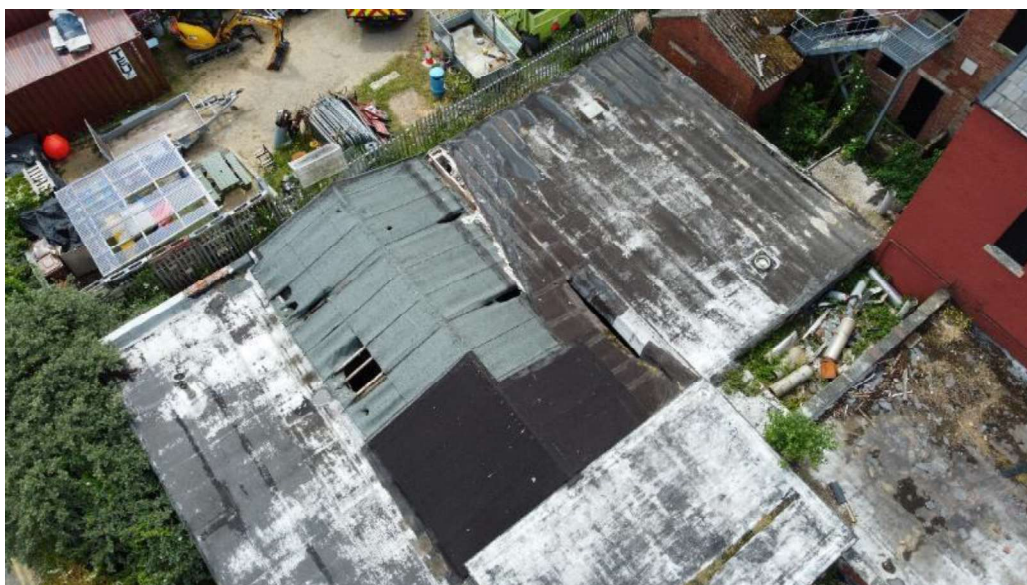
Aerial view showing general condition of flat and low pitched roofs to the rear extension. Each building has an entrance porch configured with a timber flat roof structure covered with felt, atop stonework columns. As shown in *figure 5*, flat roofs to entrance porches were either in a state of disrepair or had collapsed completely so all will require new timber roof structures and waterproof coverings.
